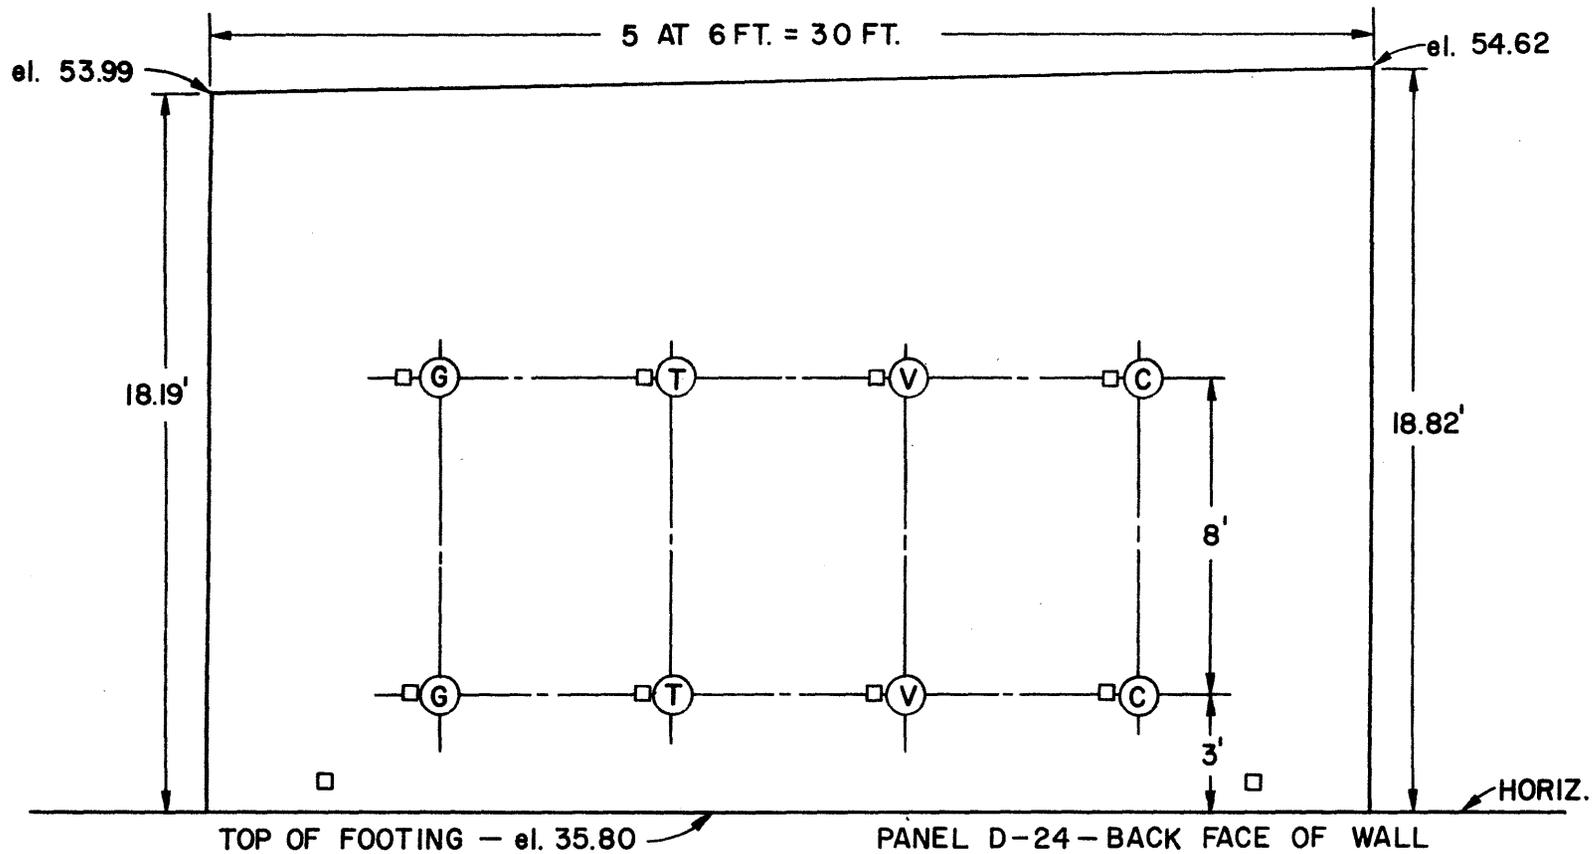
CROSS SECTION OF INSTRUMENTED RETAINING WALL PANEL.
